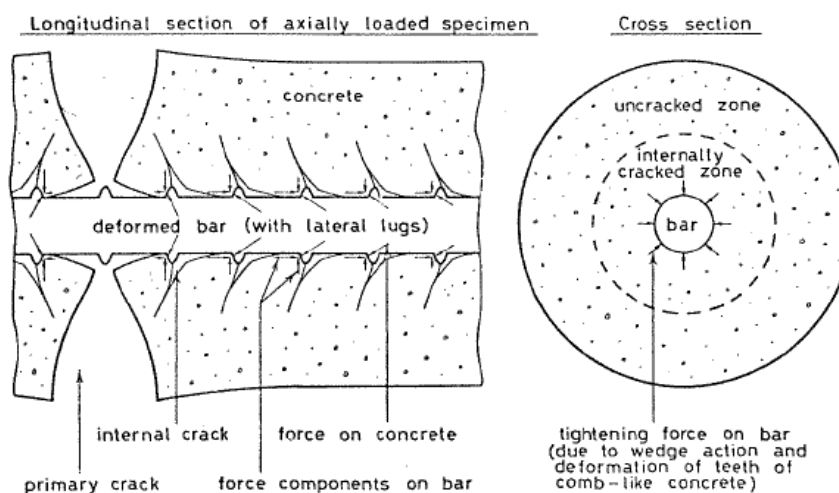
Cracking characteristics of concrete surrounding a deformed steel bar (Goto, 1971)
